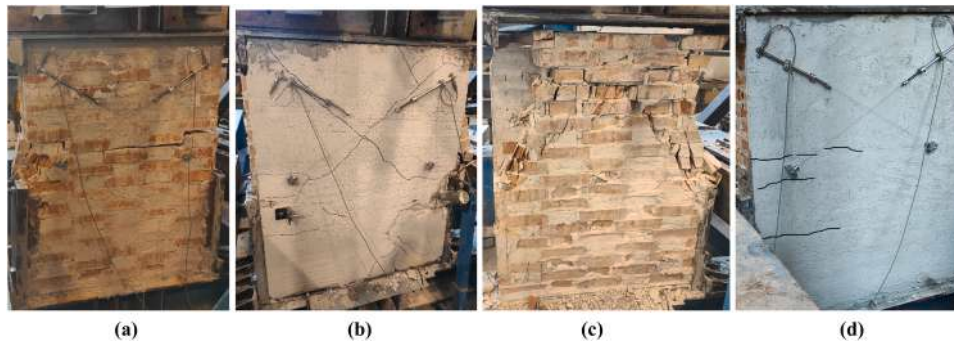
(a) Flexural failure of specimen *SC_URM_02*; (b) Diagonal cracking in the plaster and (c) in the masonry at the end of the test *SC_RM_2_02*; (d) rocking failure of the specimen *SC_RM_1_02*.
